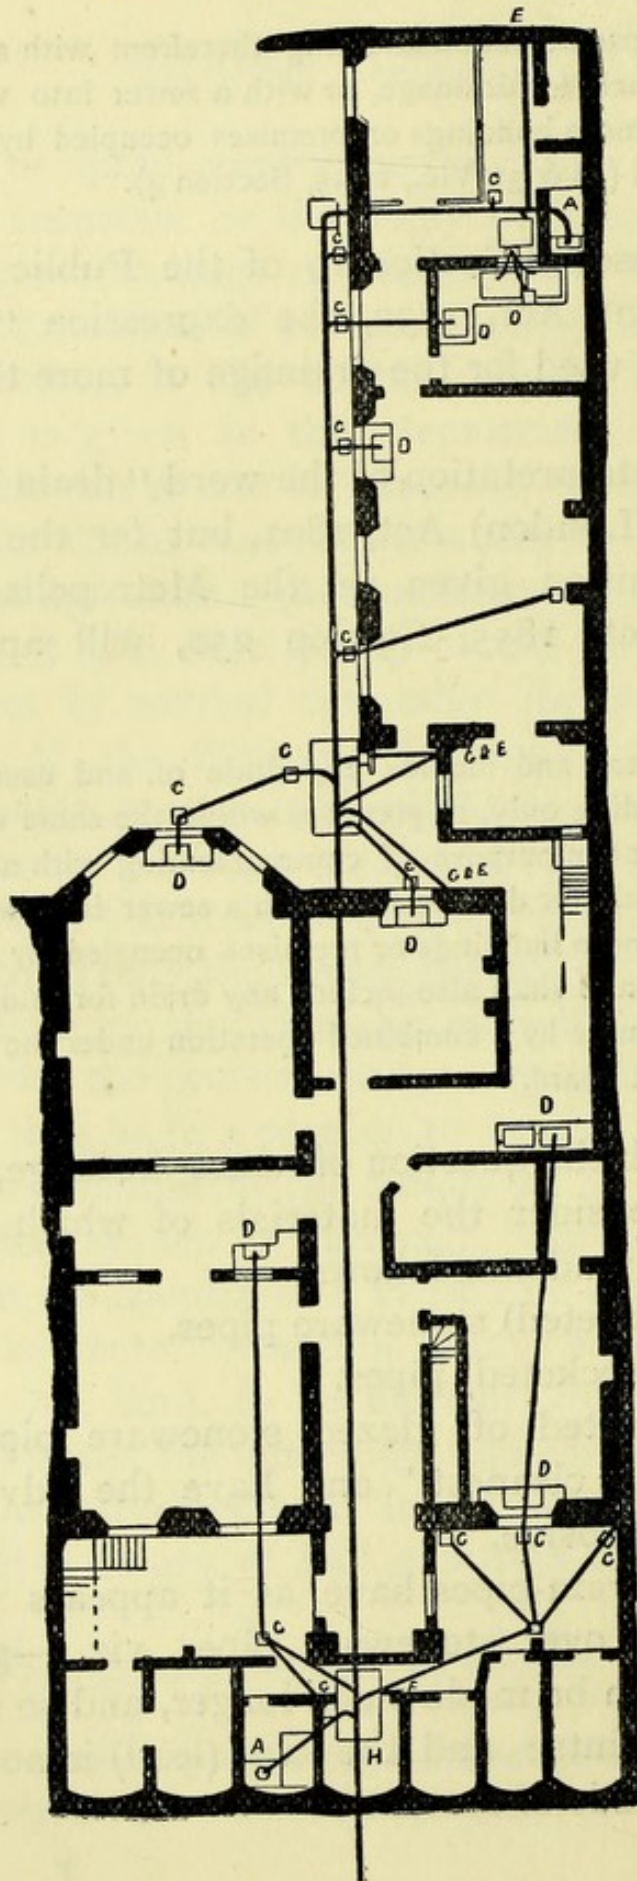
Basement plan of a town mansion, showing the method of laying the drains.
